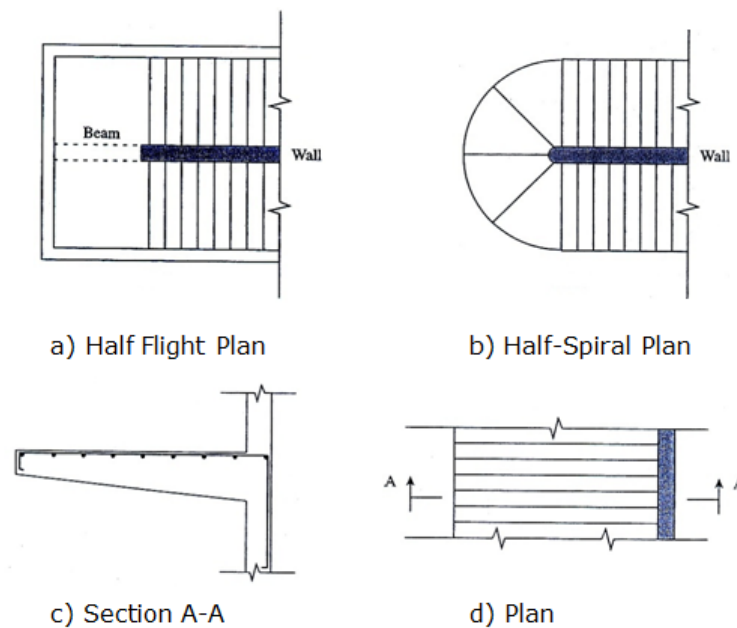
Steps projecting from one or two sides of the supporting wall
